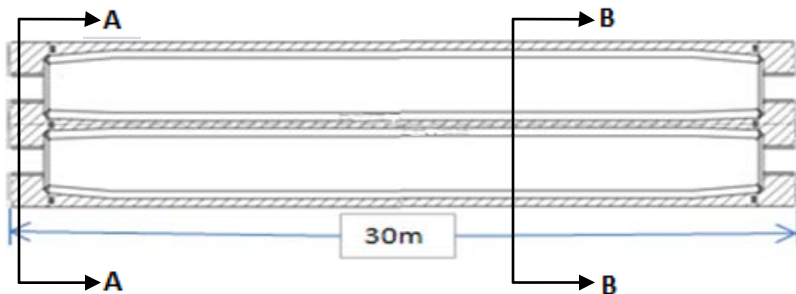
the longitudinal cross-section of the 30m simply supported box-girder
